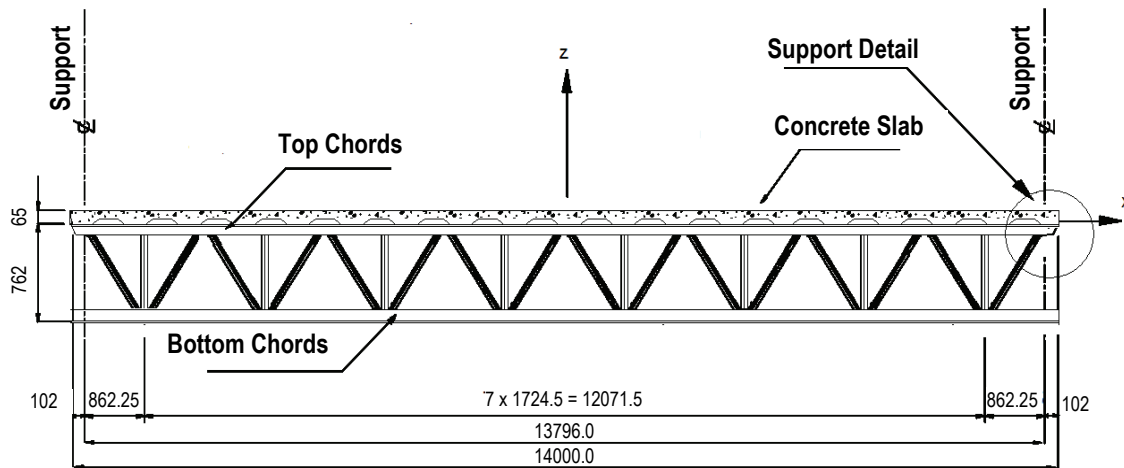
Composite floor cross section - Section AA (dimensions in mm)
